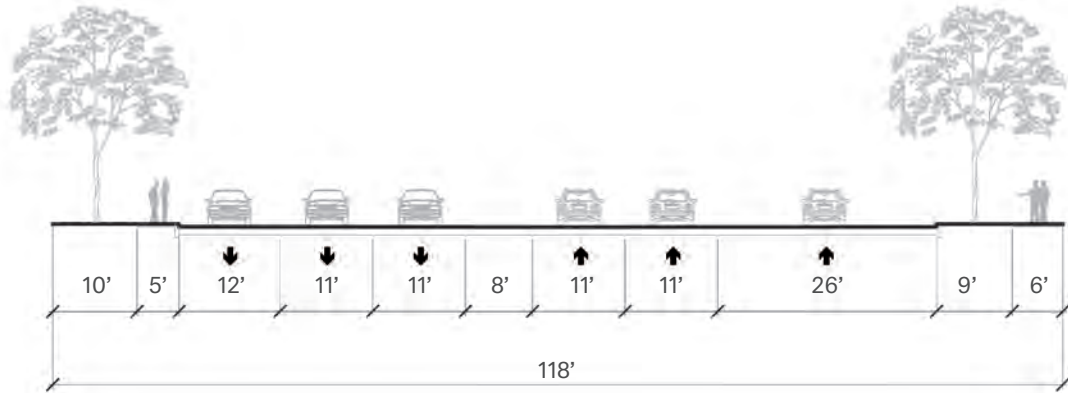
Section C-C': Existing conditions of South Congress Avenue
